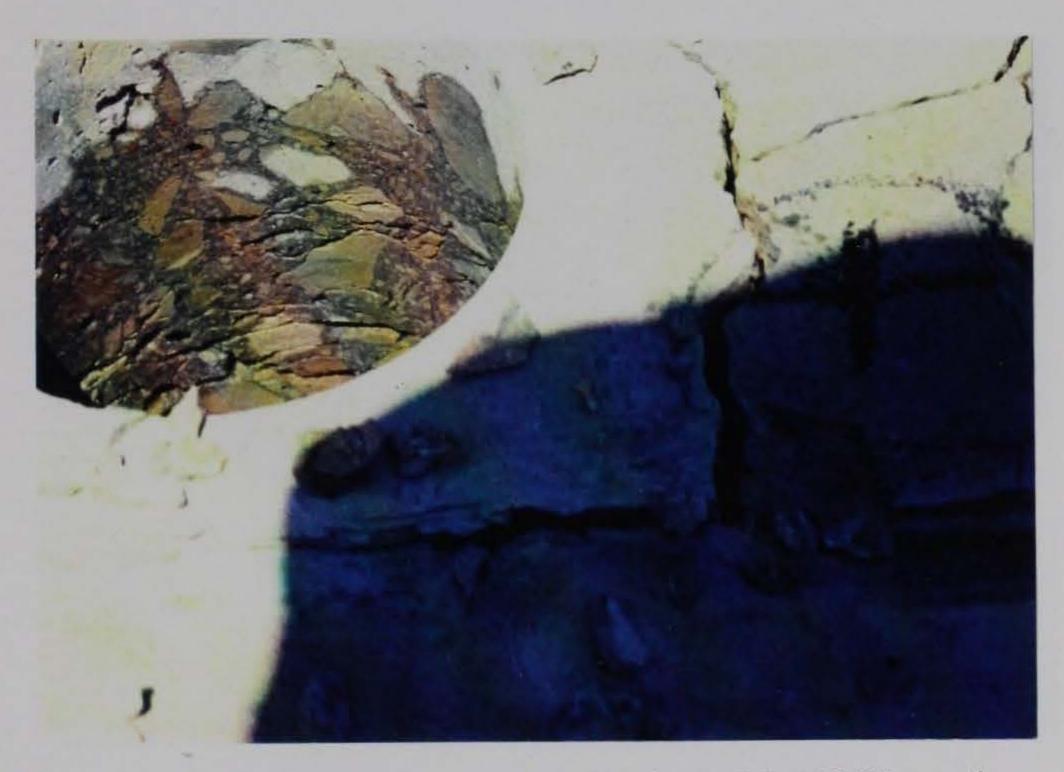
Cracks visible in the surface of boring at joint 19/20, south seawall monolith S20
